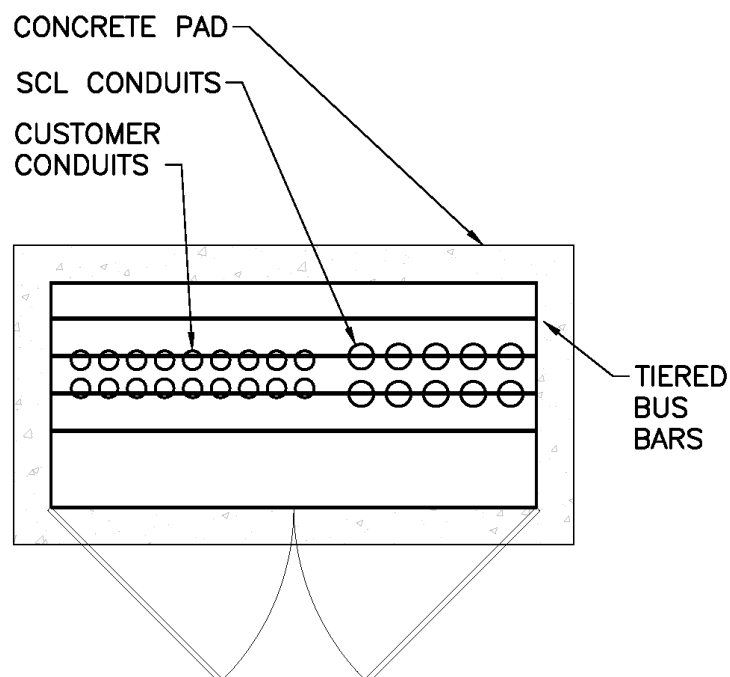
Tiered Bus Bar Conduit Arrangement
